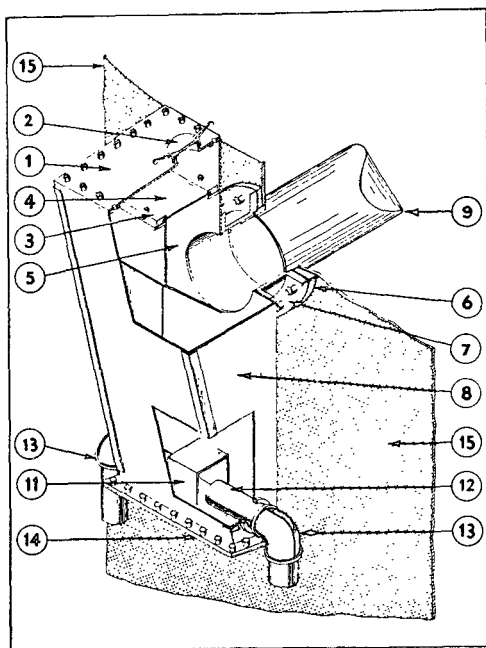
B. Chemical foam chamber. (1) Top plate. (2) Inspection cap. (3) Diaphragm frame. (4) Diaphragm. (5) Inner chamber. (6) Adapter flange shaped to fit tank curvature. (7) Chamber throat and mounting flange. (8) Chamber body. (9) Deflector. (11) Baffle. (12) Inlet nipples. (13) Inlet solution elbows. (14) Bottom plate. (15) Tank shell.
